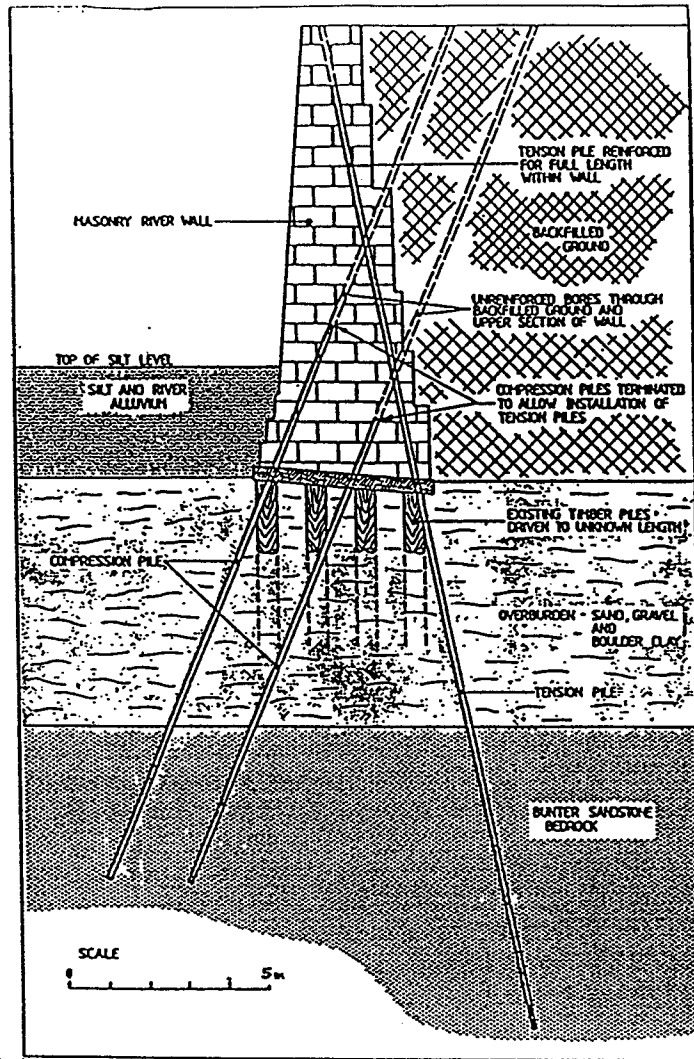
Typical cross section through piled wall, Albert Docks, Liverpool, England (Turner and Wilson, 1990).
